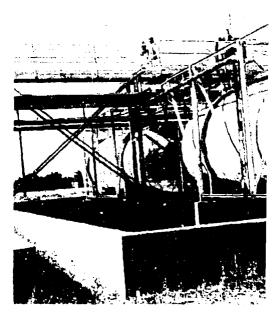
Typical fire deluge structure over horizontal storage tanks
